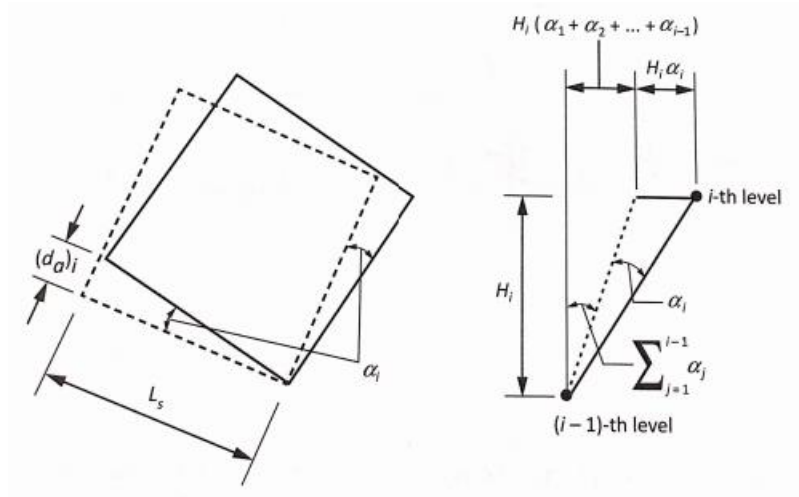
Deflection Due to Vertical Elongation of the Wall Anchorage System at the i-th Storey (CSA 2014)
